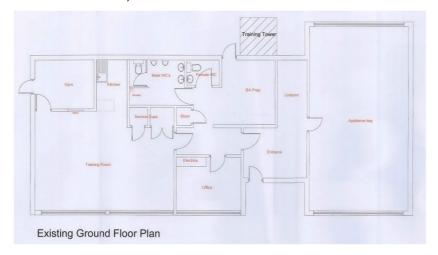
Existing Floor Plan (Prior to planning approvals granted in 2008).
